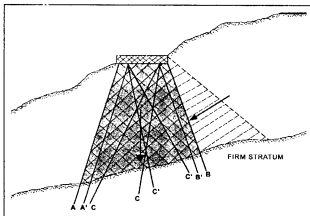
Reticulated Root Piles for Gravity Retaining Walls
